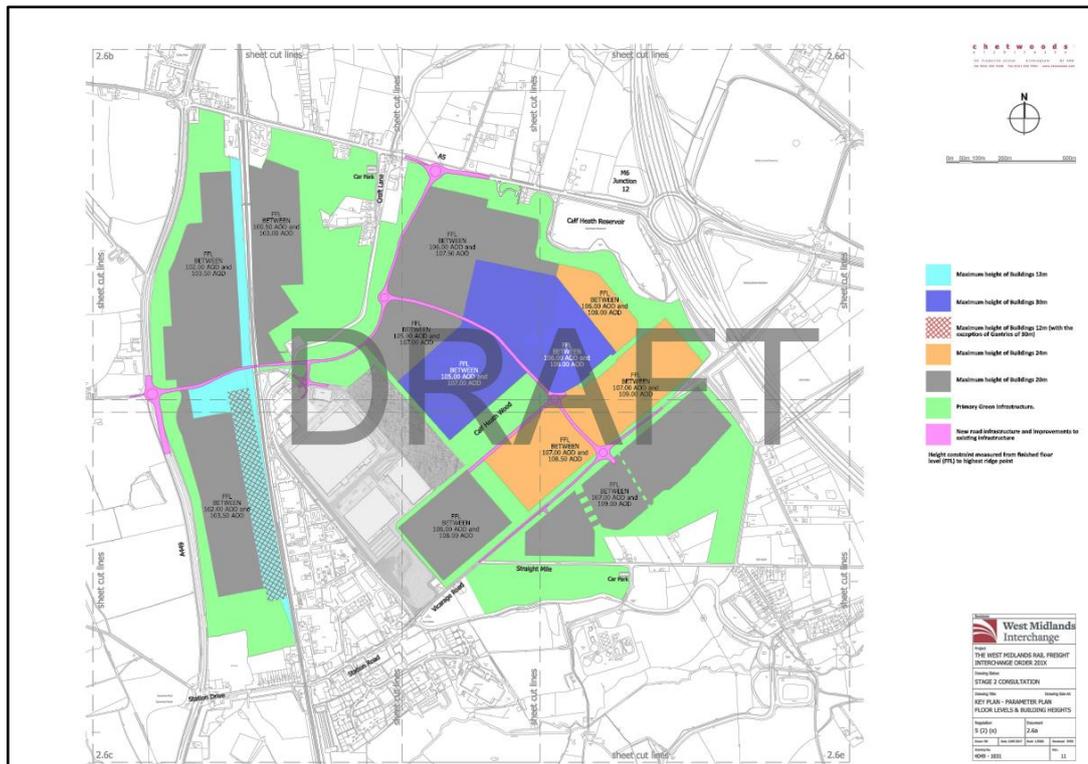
WMI Draft Floor Level and Building Heights Parameter Plan
